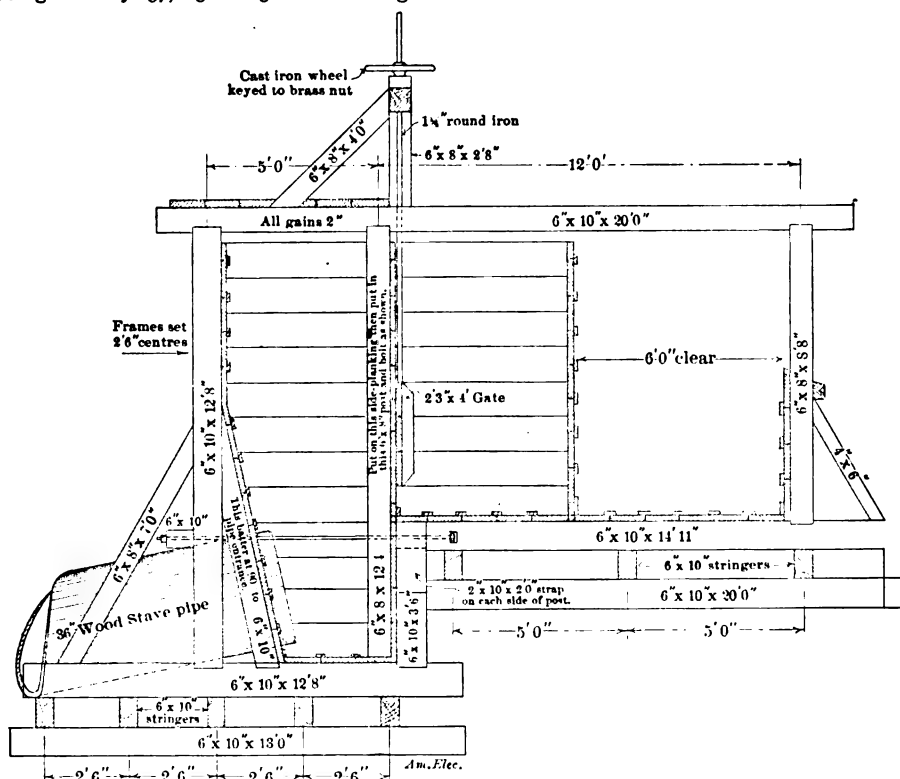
SECTIONAL VIEW OF PENSTOCK.
